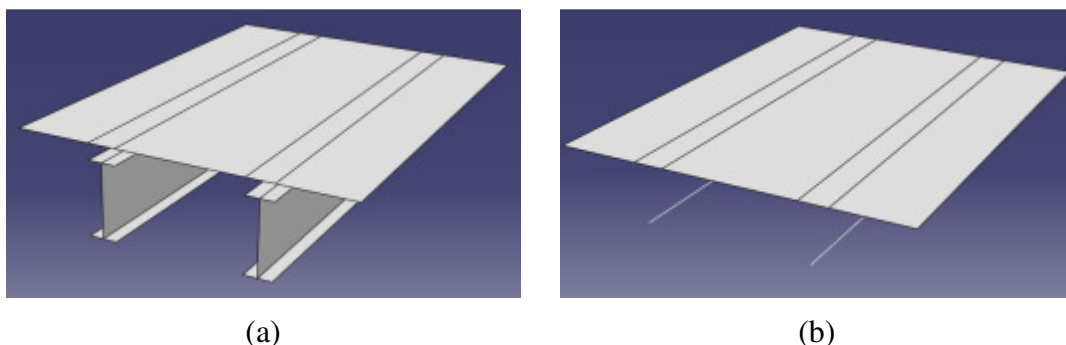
Two methods for modelling of girder and deck system such that each element's axis coincides with the member's centreline in the actual structure; (a) shell elements for all members; (b) beam elements for girder and shell elements for the deck (Bengtsson and Widén 2010).
